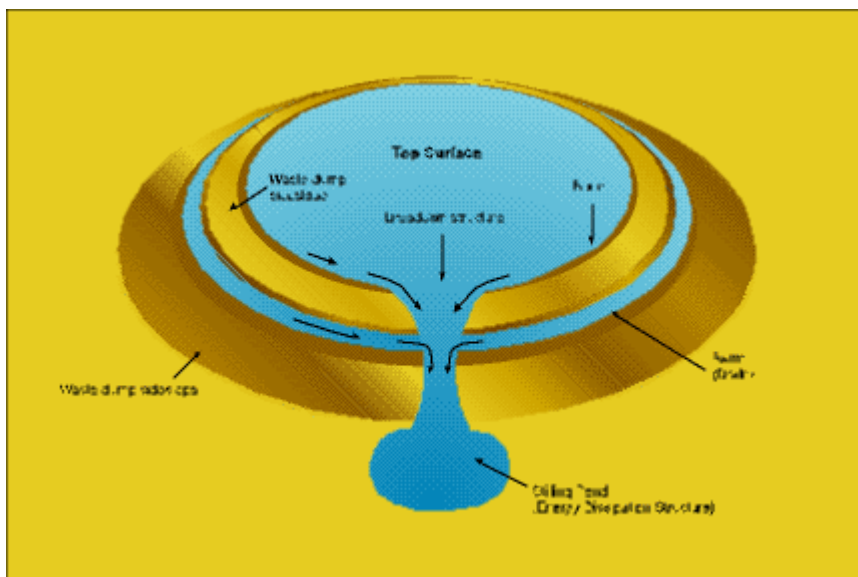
Waste Rock with Berm Drop-down Drain and Silting Pond
